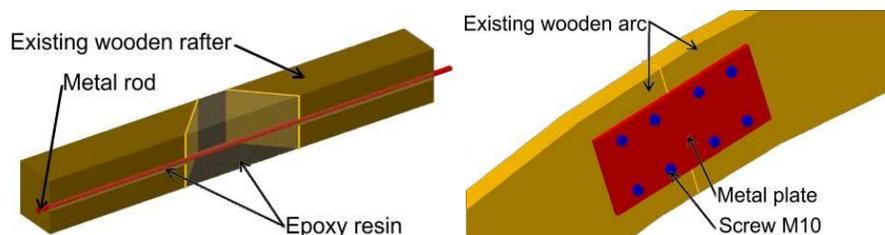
The consolidation solution of the wooden arches and rafters
